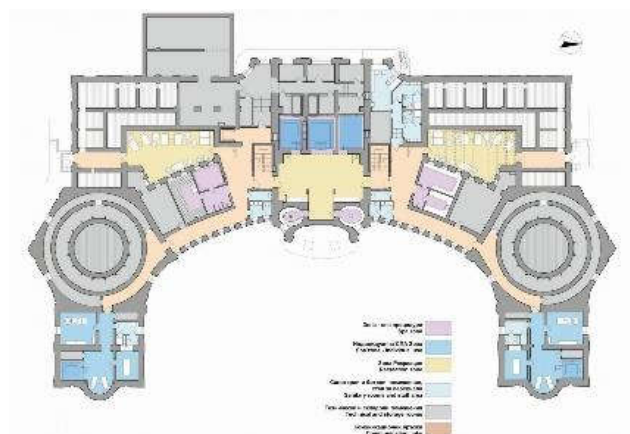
Plan of the Bath in Bankya. Basement. [12]
